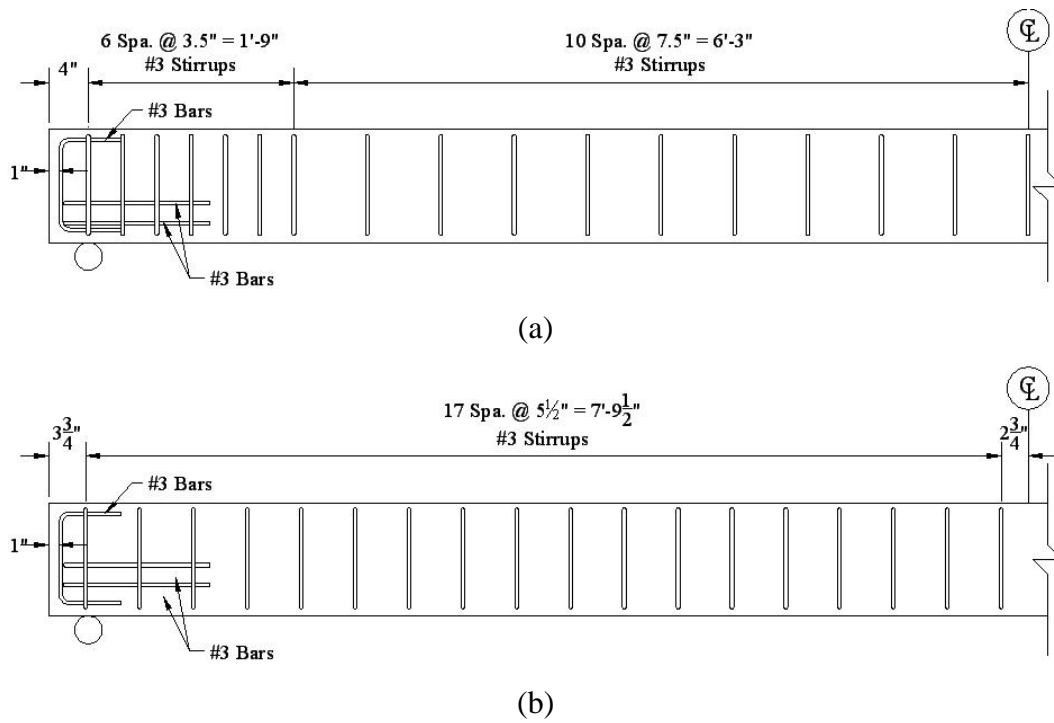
Cross section of (a) prestressed beam (b) reinforced beam.
